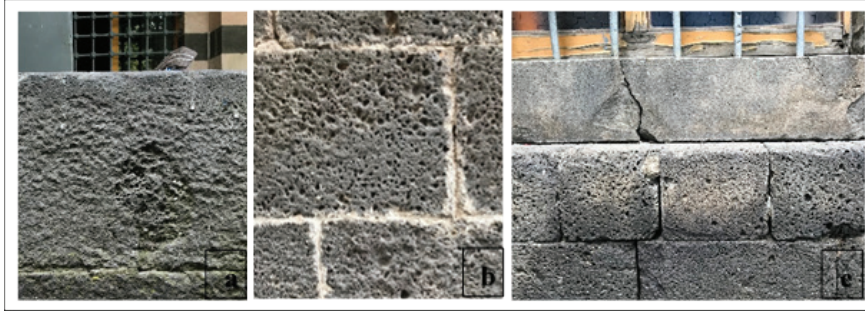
Alveolization a. Raised Floor of the North Façade b. West Façade Wall c. Window on the South Façade
